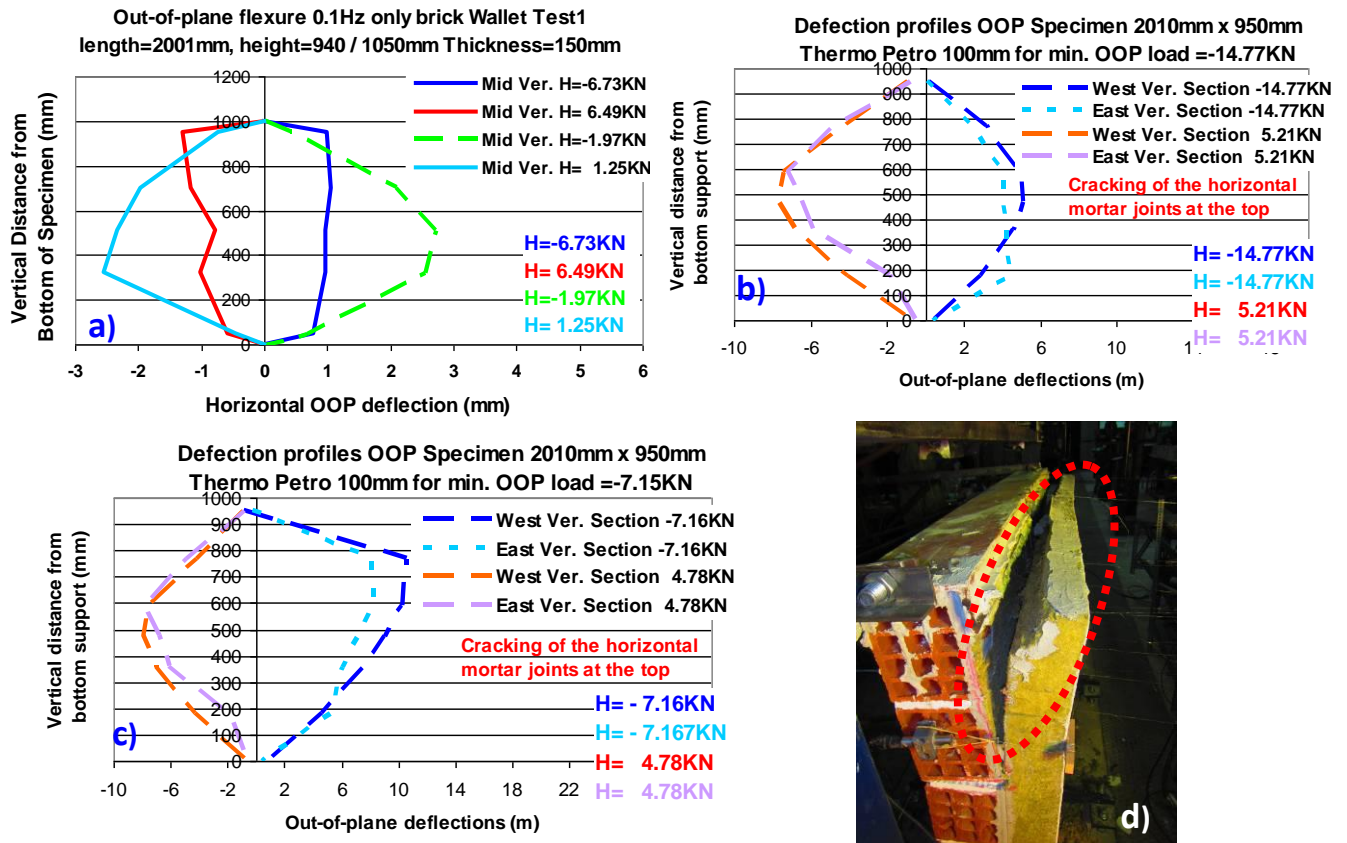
Observed out-of-plane flexural response of brick wallets. a) Wallet without any thermo-insulation. b) and c) Wallet with a thermo-insulating façade constructed with 100mm thick panel of mineral wool. d) De-bonding of the thermo-insulating panel from the brick wallet at the top part of the wallet.
